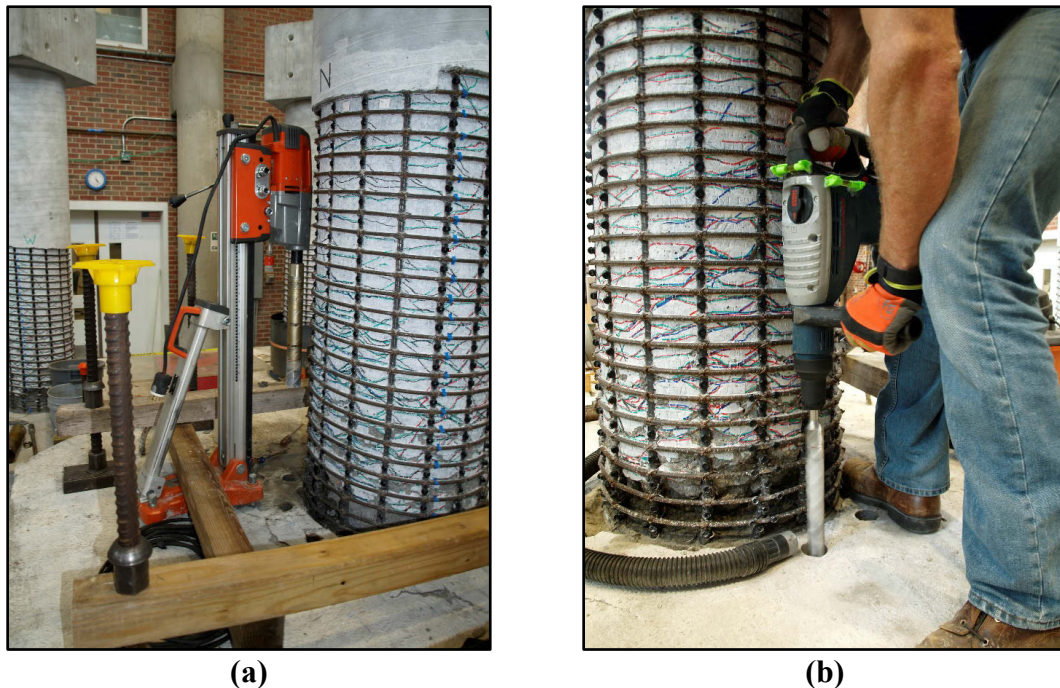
Setup for (a) core drilling and; (b) hammer drilling
